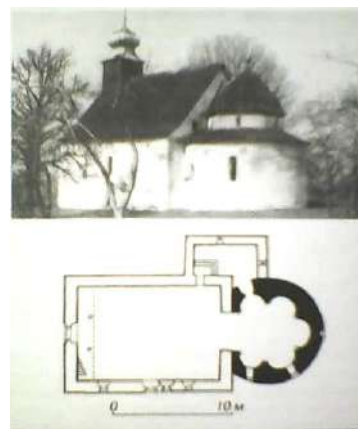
Church-Rotunda XII-XIV centuries, Located in the village of Goryany (suburb of Uzhgorod). Facade and plan [1, p. 136]
